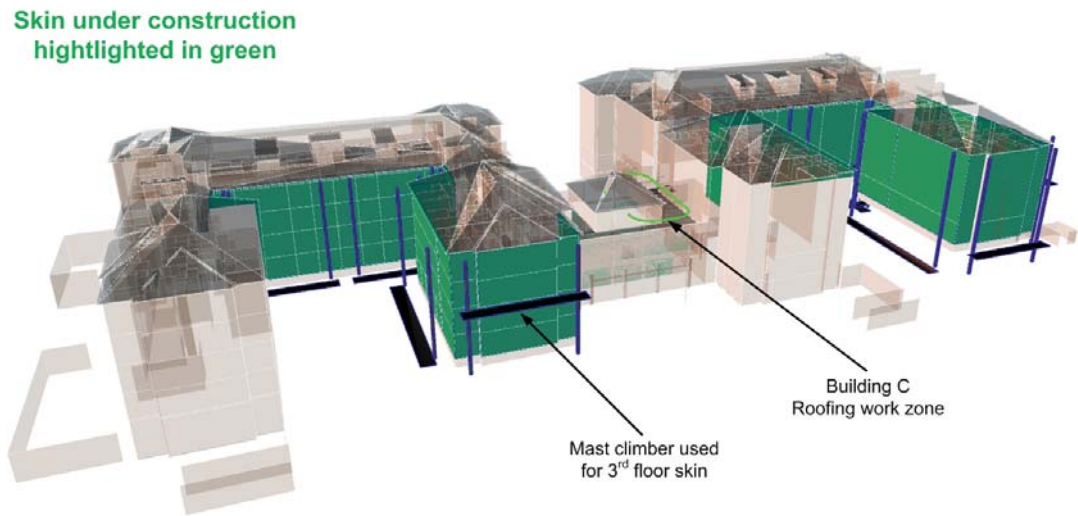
Mast climber scaffolding and structural work zones in 4D BIM
